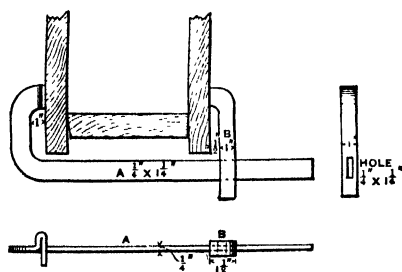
Clamp for Beam or Small Column Form. (See p. 651.)
